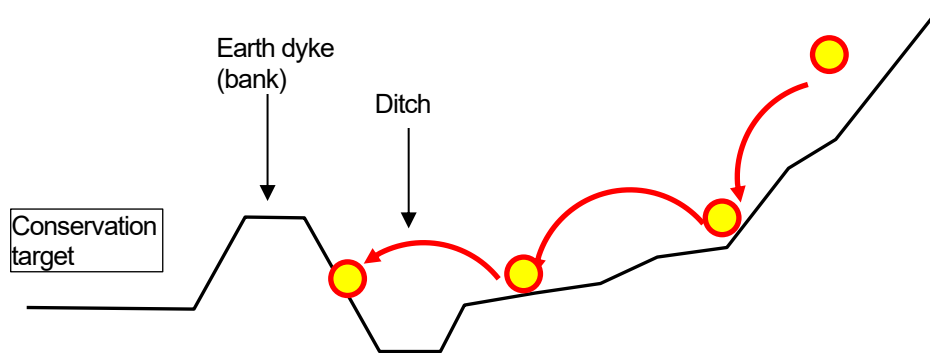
Image diagram of rockfall protection earth dyke / ditch
